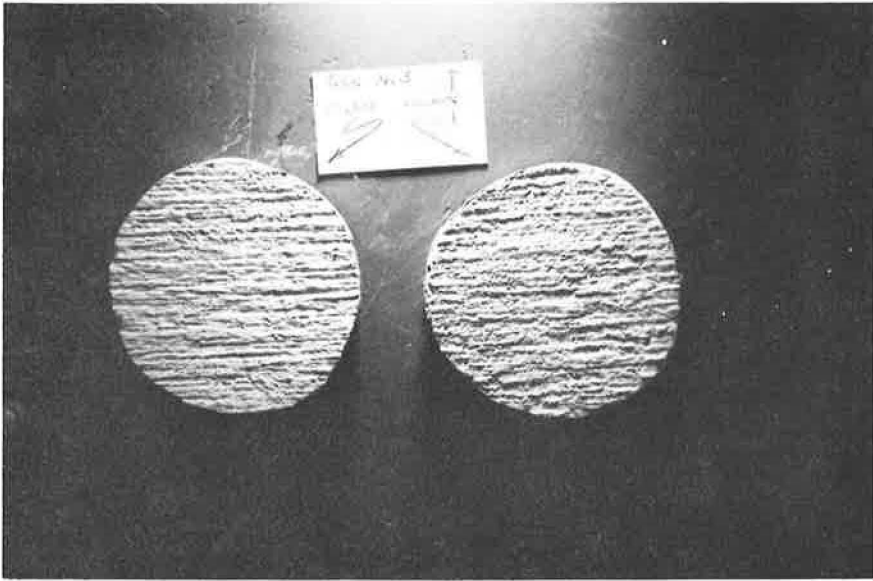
Plaster-of-paris casts of surface of portland cement concrete pavement before testing (left) and after 200 stop applications (right).
